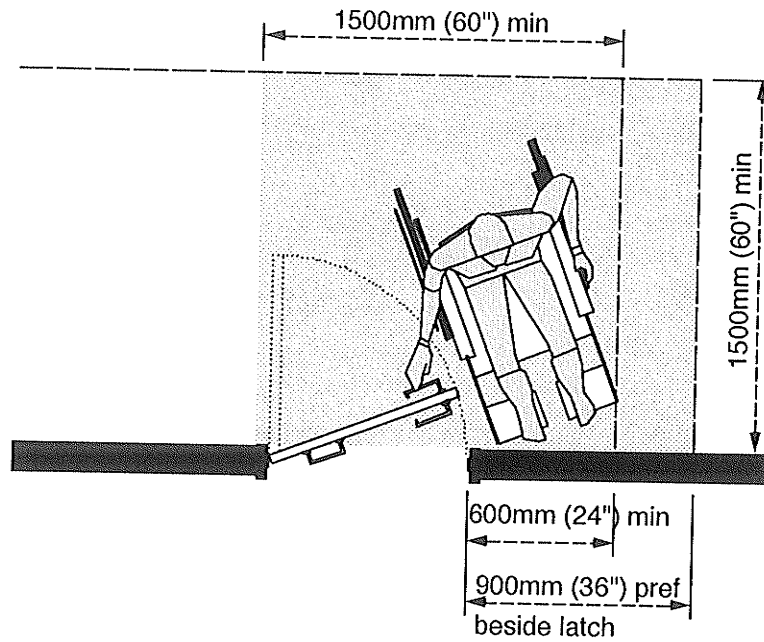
Minimum Doorway Maneuvering Space, Side-hinged Door, Hinge Side Approach, Pull Side
